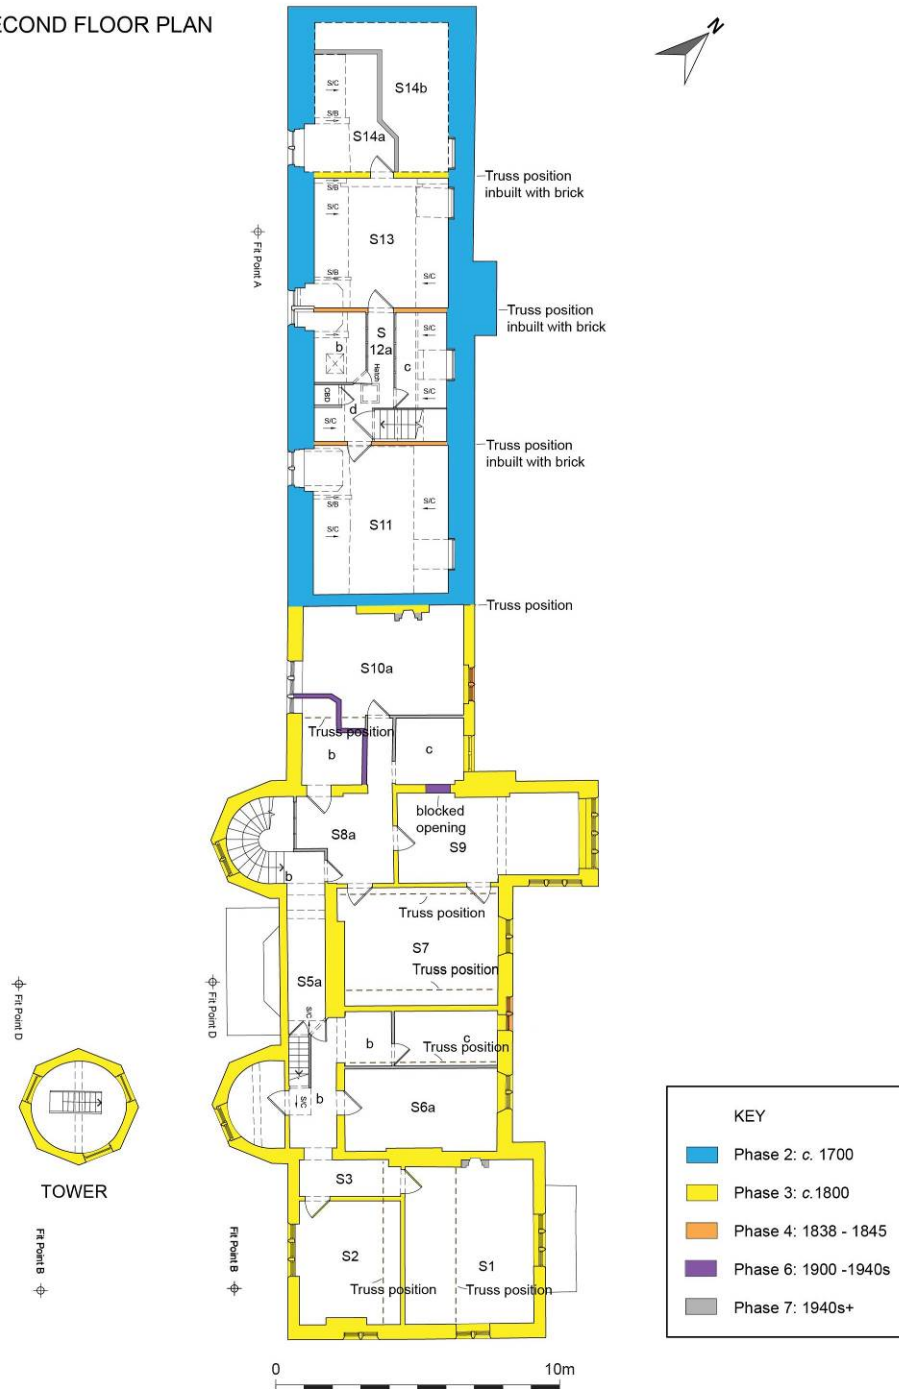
Second-floor plan to show the layout of Ribbesford House and the room numbering scheme (Worcestershire Archaeology 2019)
